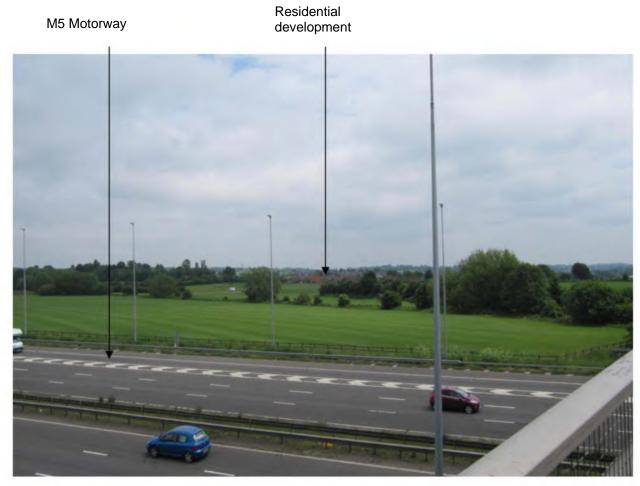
View from Fockbury Mill Lane looking north east across site
